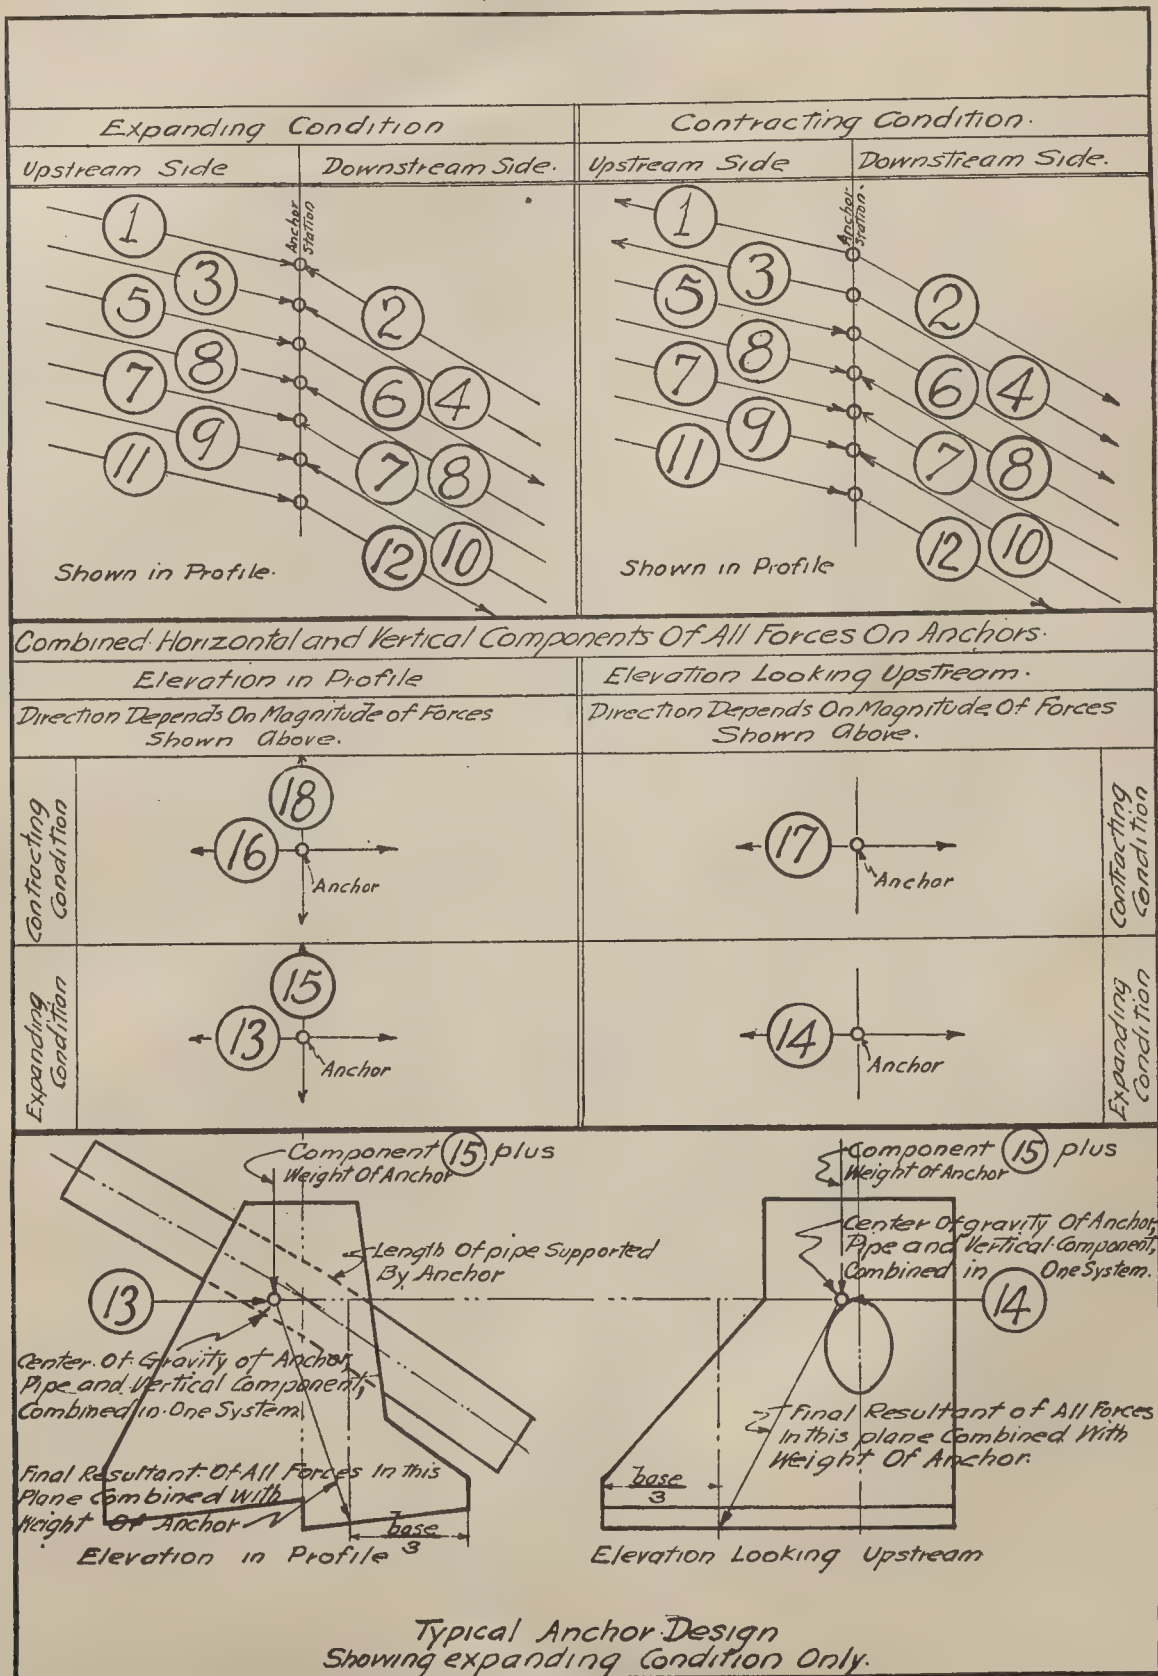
DIAGRAMS SHOWING EXTERIOR FORCES ON ANCHOR.
